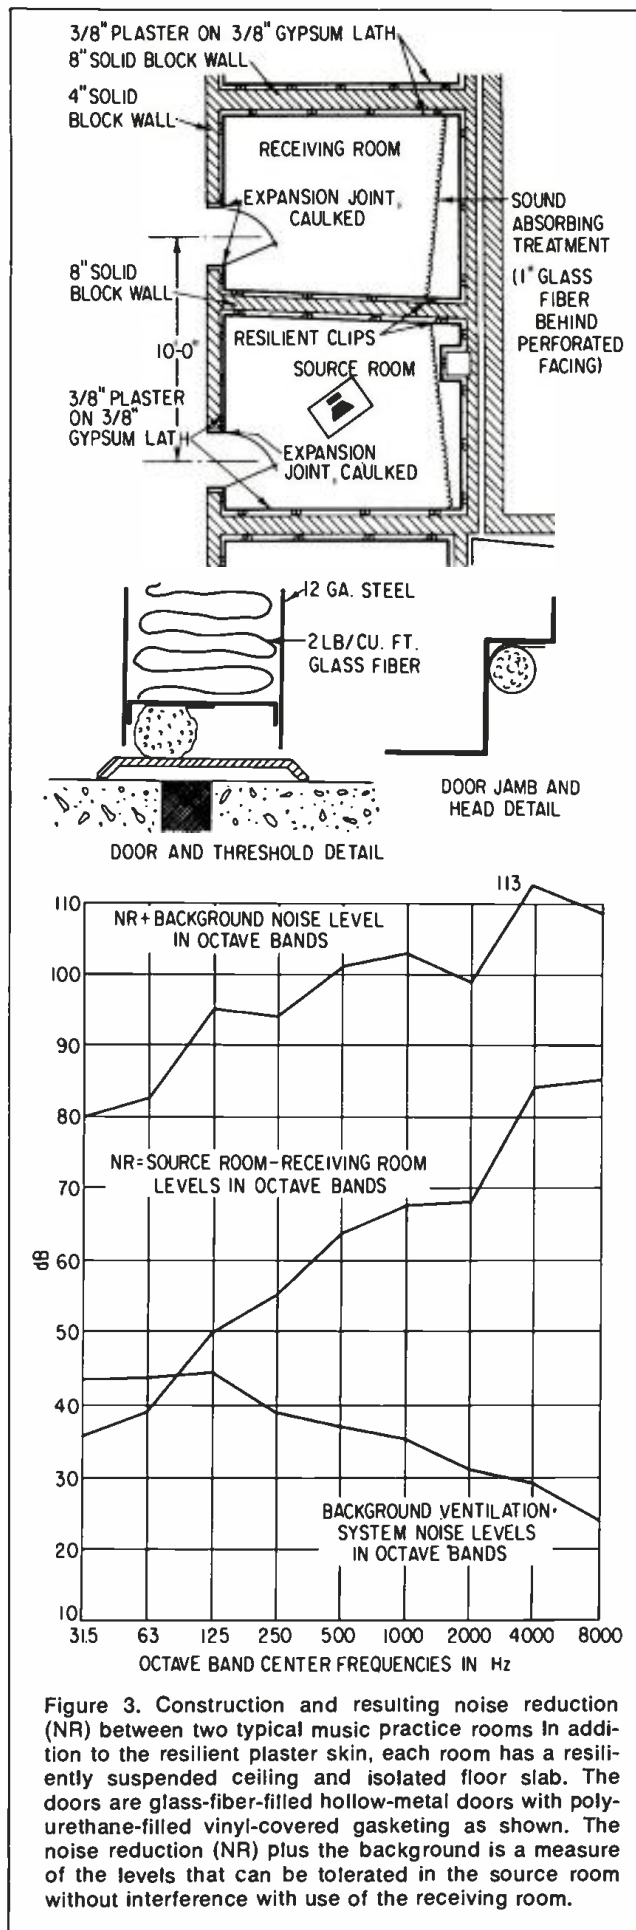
Construction and resulting noise reduction (NR) between two typical music practice rooms. In addition to the resilient plaster skin, each room has a resiliently suspended ceiling and isolated floor slab. The doors are glass-fiber-filled hollow-metal doors with polyurethane-filled vinyl-covered gasketing as shown. The noise reduction (NR) plus the background is a measure of the levels that can be tolerated in the source room without interference with use of the receiving room.
